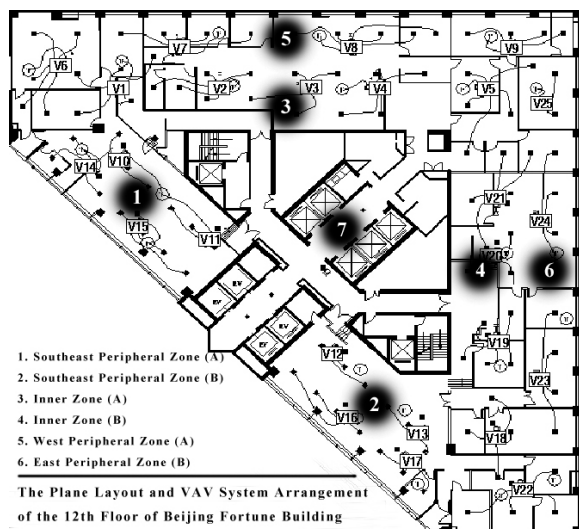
The plane layout and the VAV system arrangement of the 12th floor
